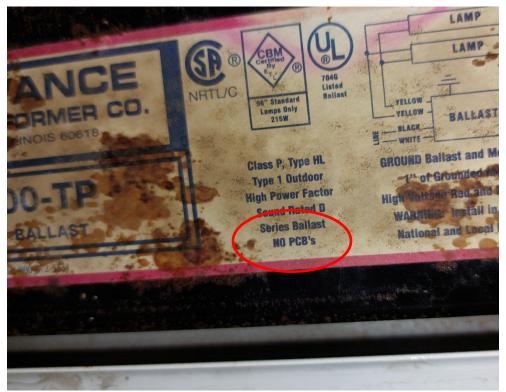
"No PCB" labeling on all lighting ballasts observed
